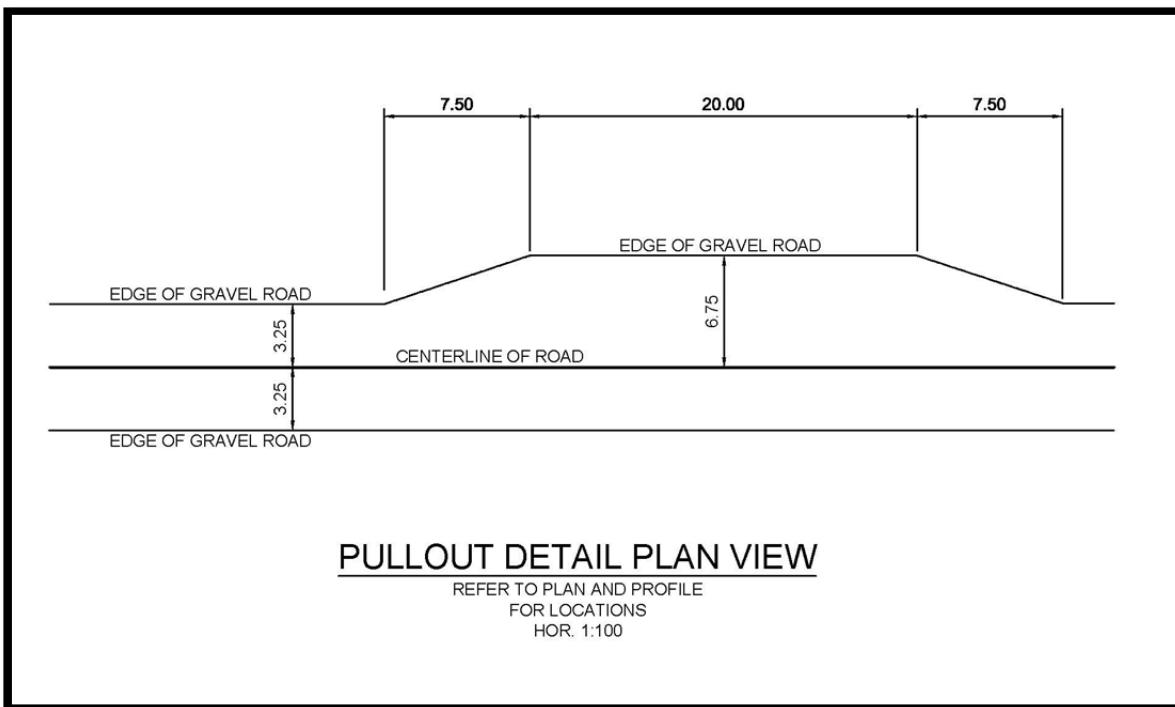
Plan View of Typical Road at a Passing Turnout
